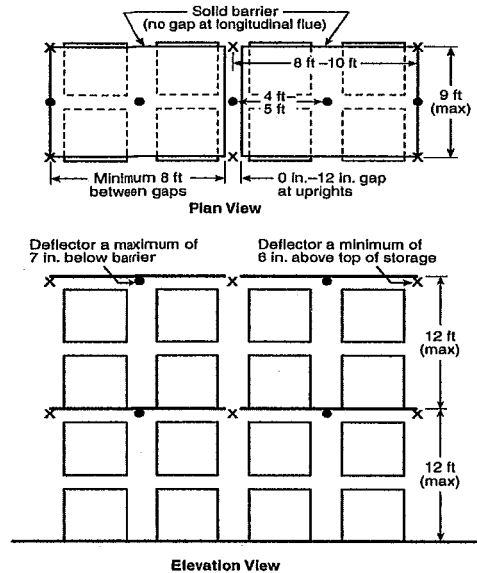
(b) Double-Row Rack Sprinkler Layout for Design Scheme "A." [30: Figure 16.6.1.1(b)]
